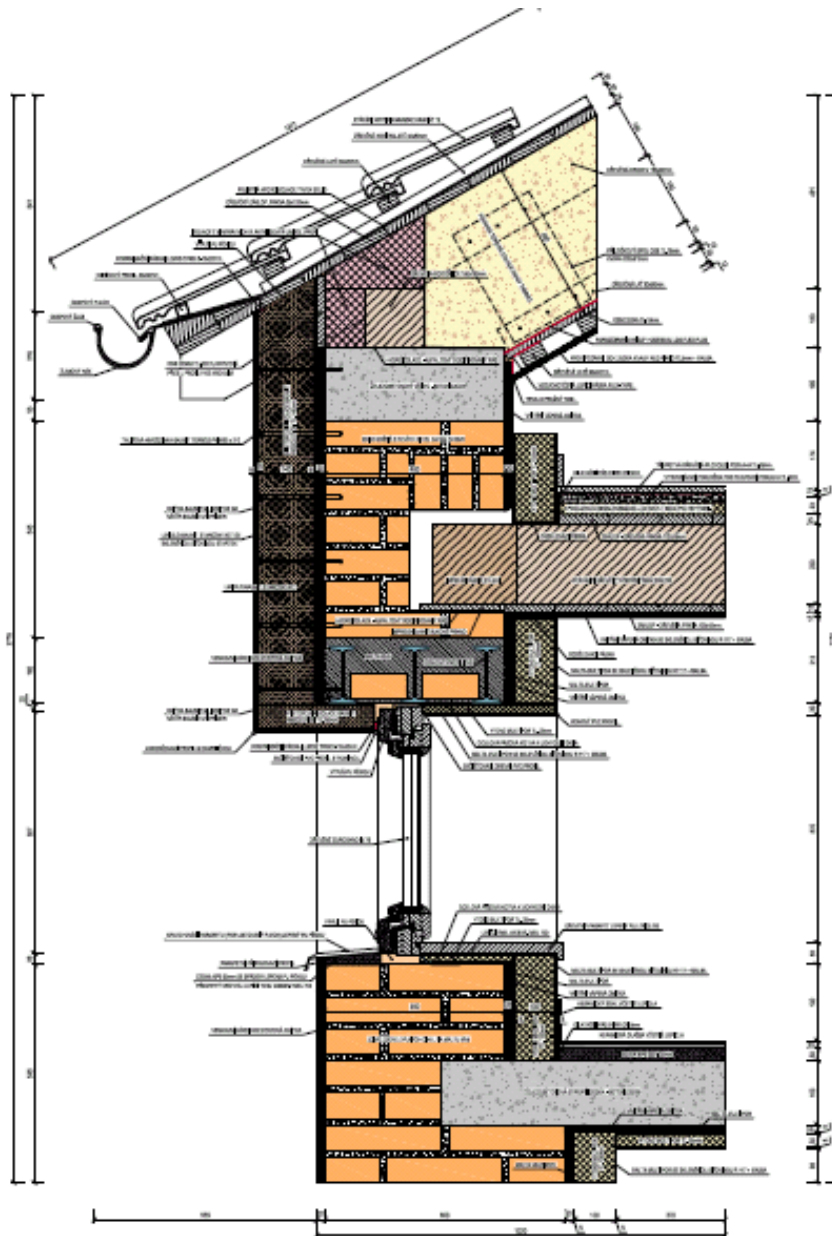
Model No. 2. DER of brickwork house with two solutions for insulating – internal and external.
